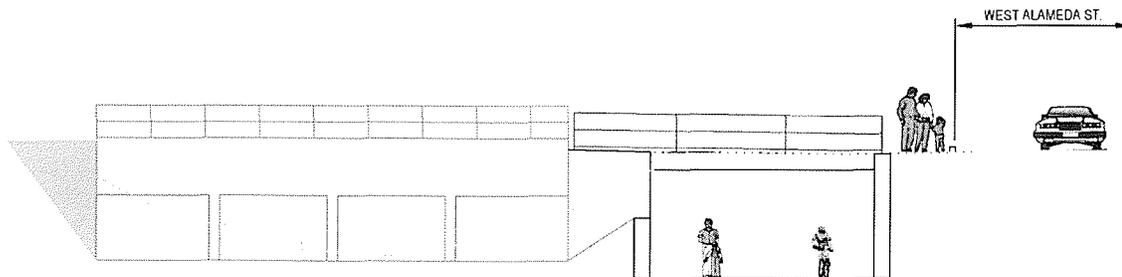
North Underpass Alternative Conceptual Elevation (Looking West)
